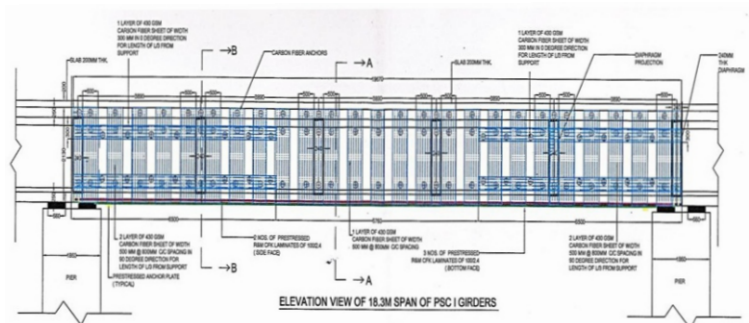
Elevation View of 18.3m Span of Ratlam Railway Bridge PSC I Girders.
